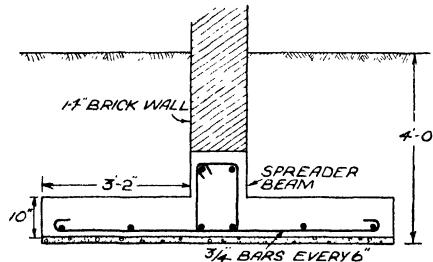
FOOTING SLAB FOR 14-IN. WALL
